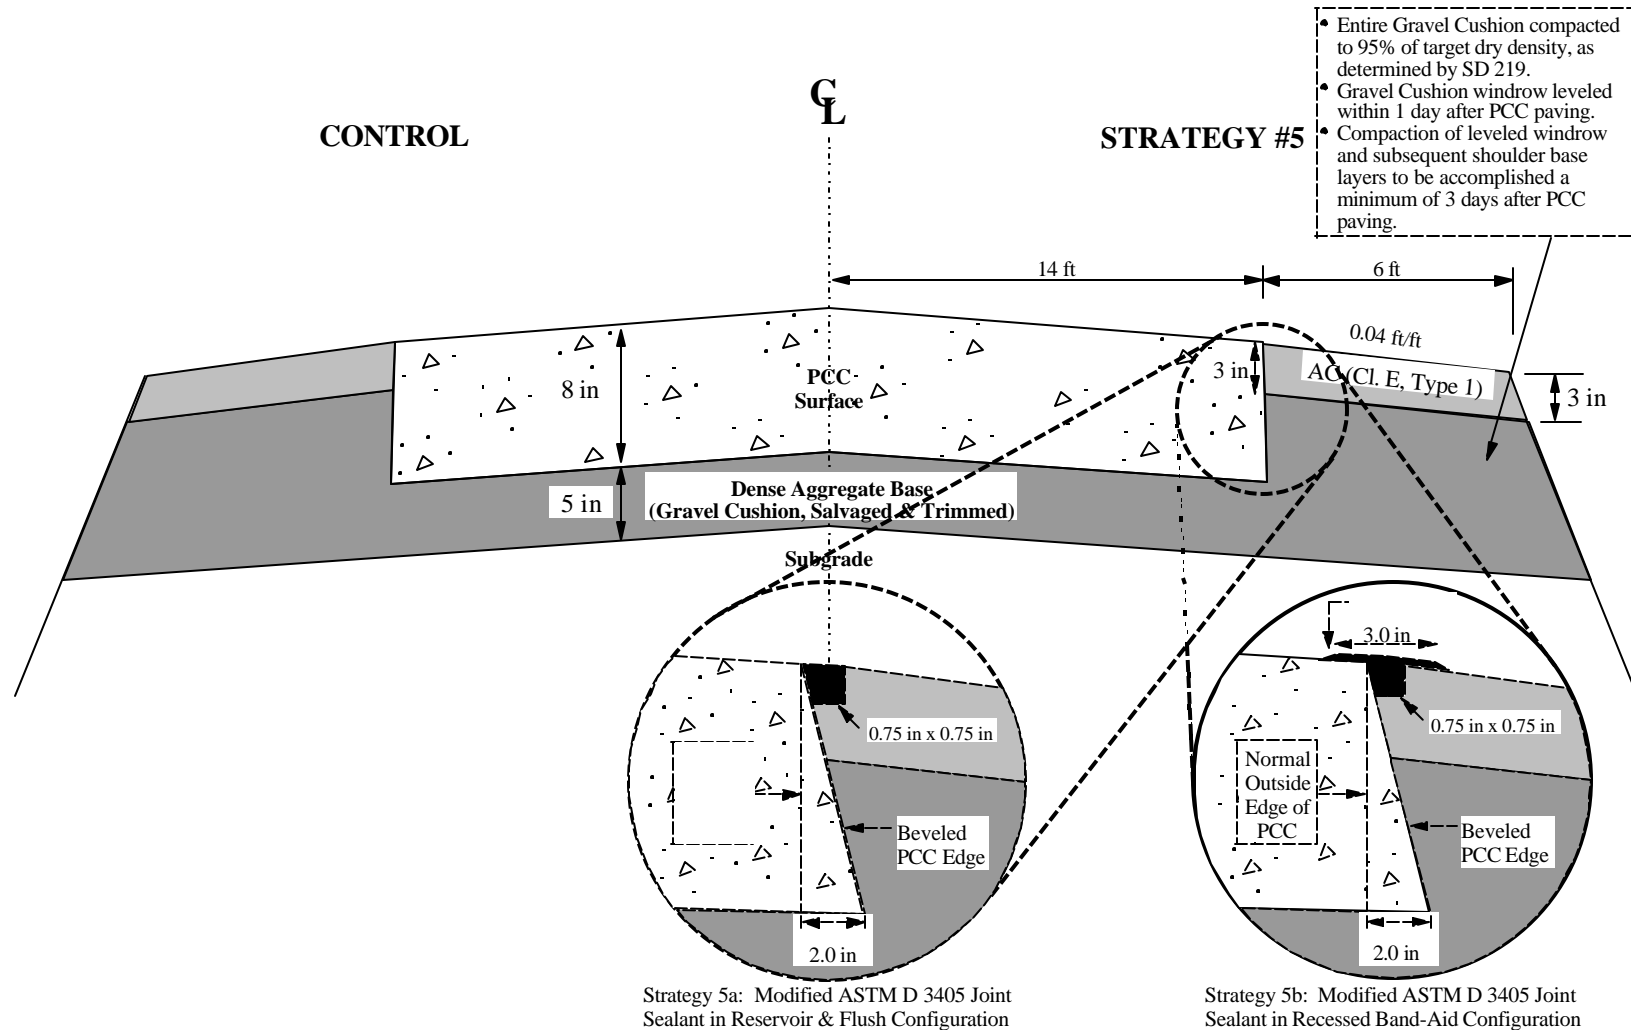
Cross-section of beveled PCC edge strategy (as viewed NB in replicate 1 and SB in replicate 2).
